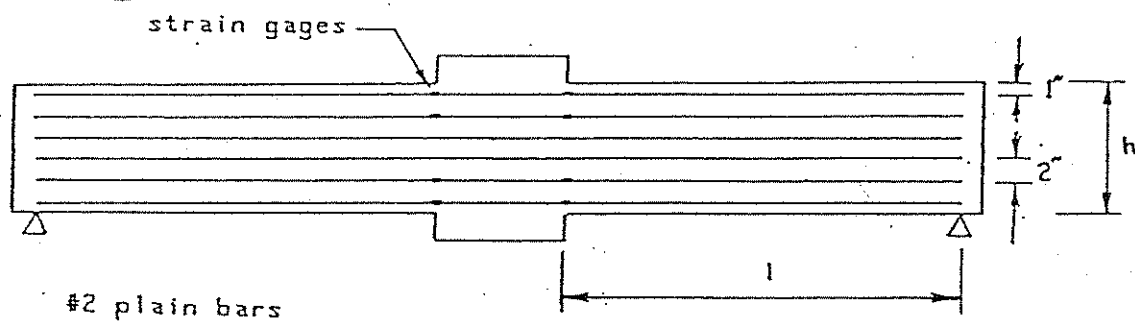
Test Specimens and Location of Reinforcing Bars and Strain Gages.
